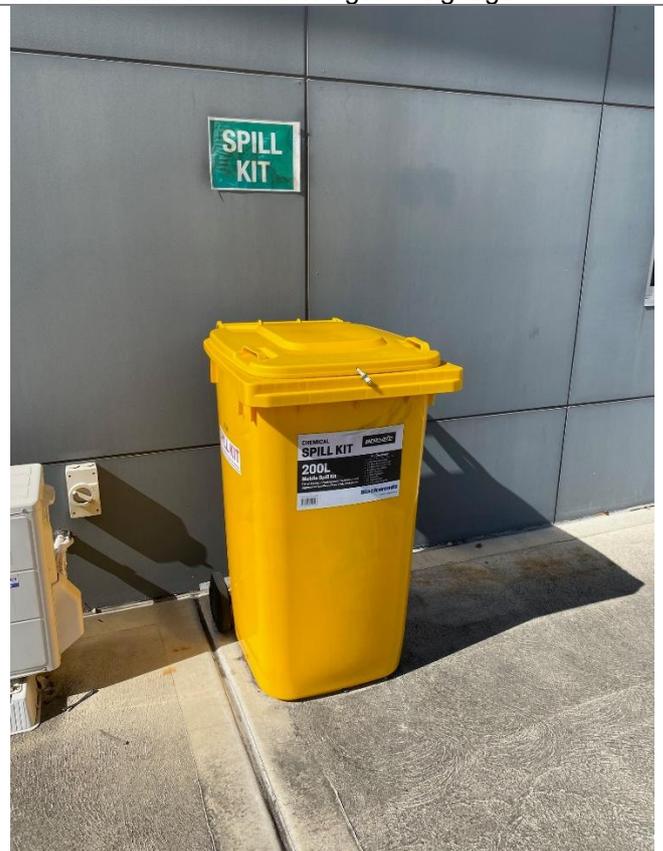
Spill kit located outside the site office, adjacent to the entry gate
